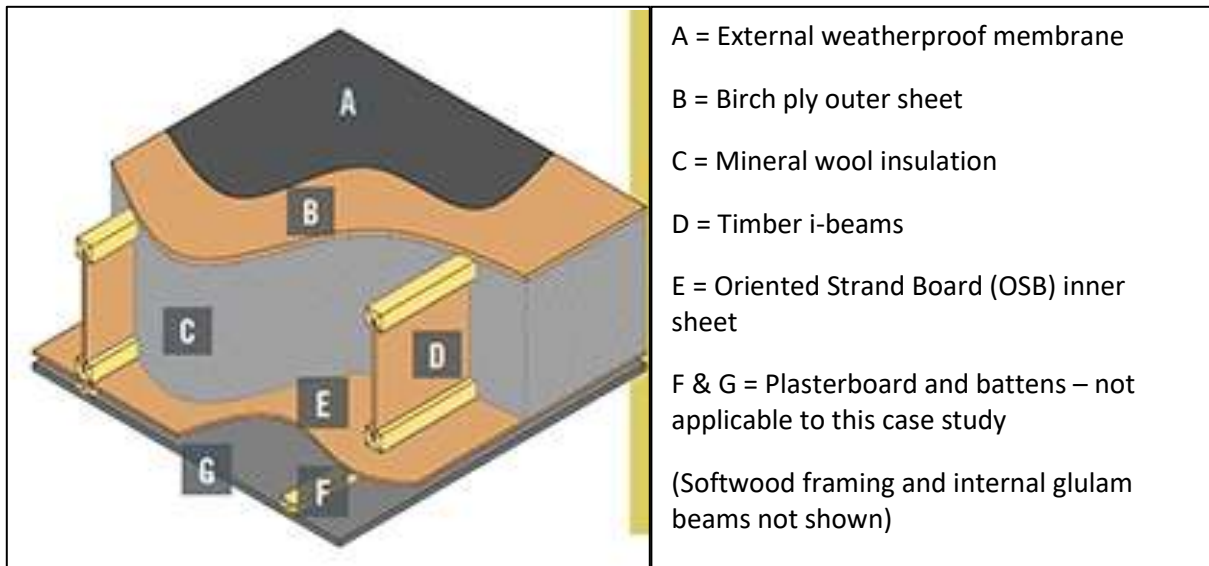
Section of an insulated timber roof cassette (Source: Stewart Milne Timber Systems)
